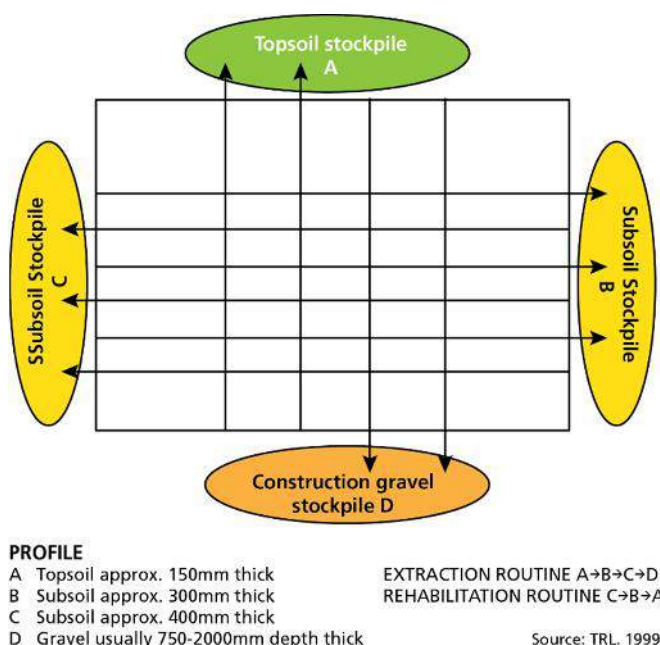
Recommended procedure for removal of overburden and stockpiling
